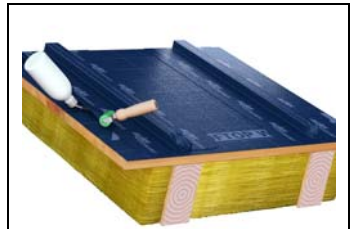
Welding version of the ALUJET Konterlattenstreifen
